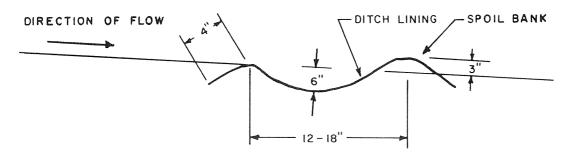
Cross section of typical lined collection ditch. Spoil bank is composed of material excavated from collection ditch.
